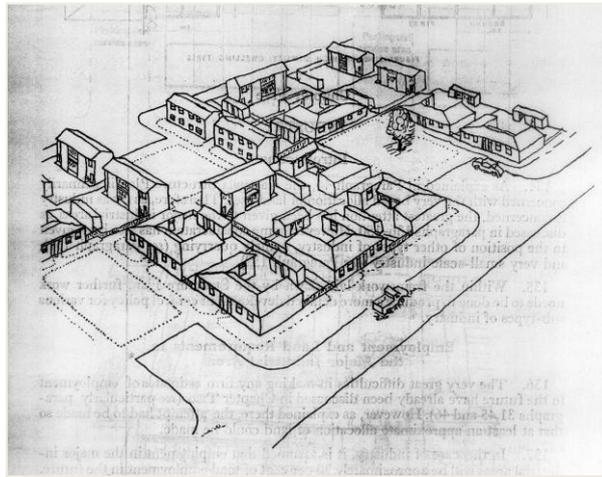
Three-dimensional proposal of the medium-high density layout. (Source: Kampala Development Plan, 1972).
